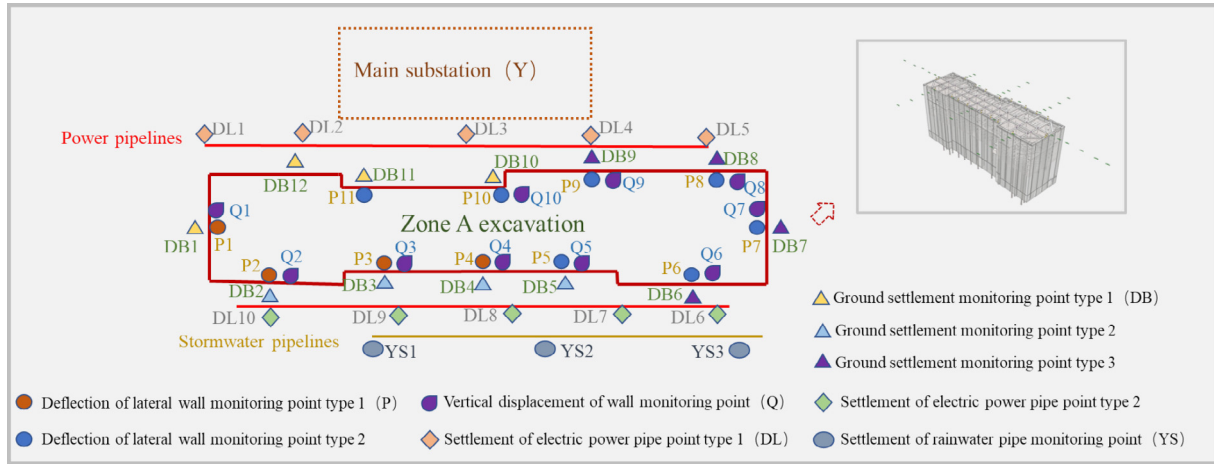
Layout of the monitoring points in the foundation pit project area.
